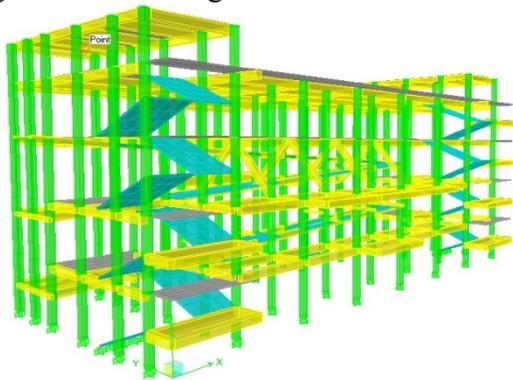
3-D Modelling of Ulak Karang Shelter Structure
